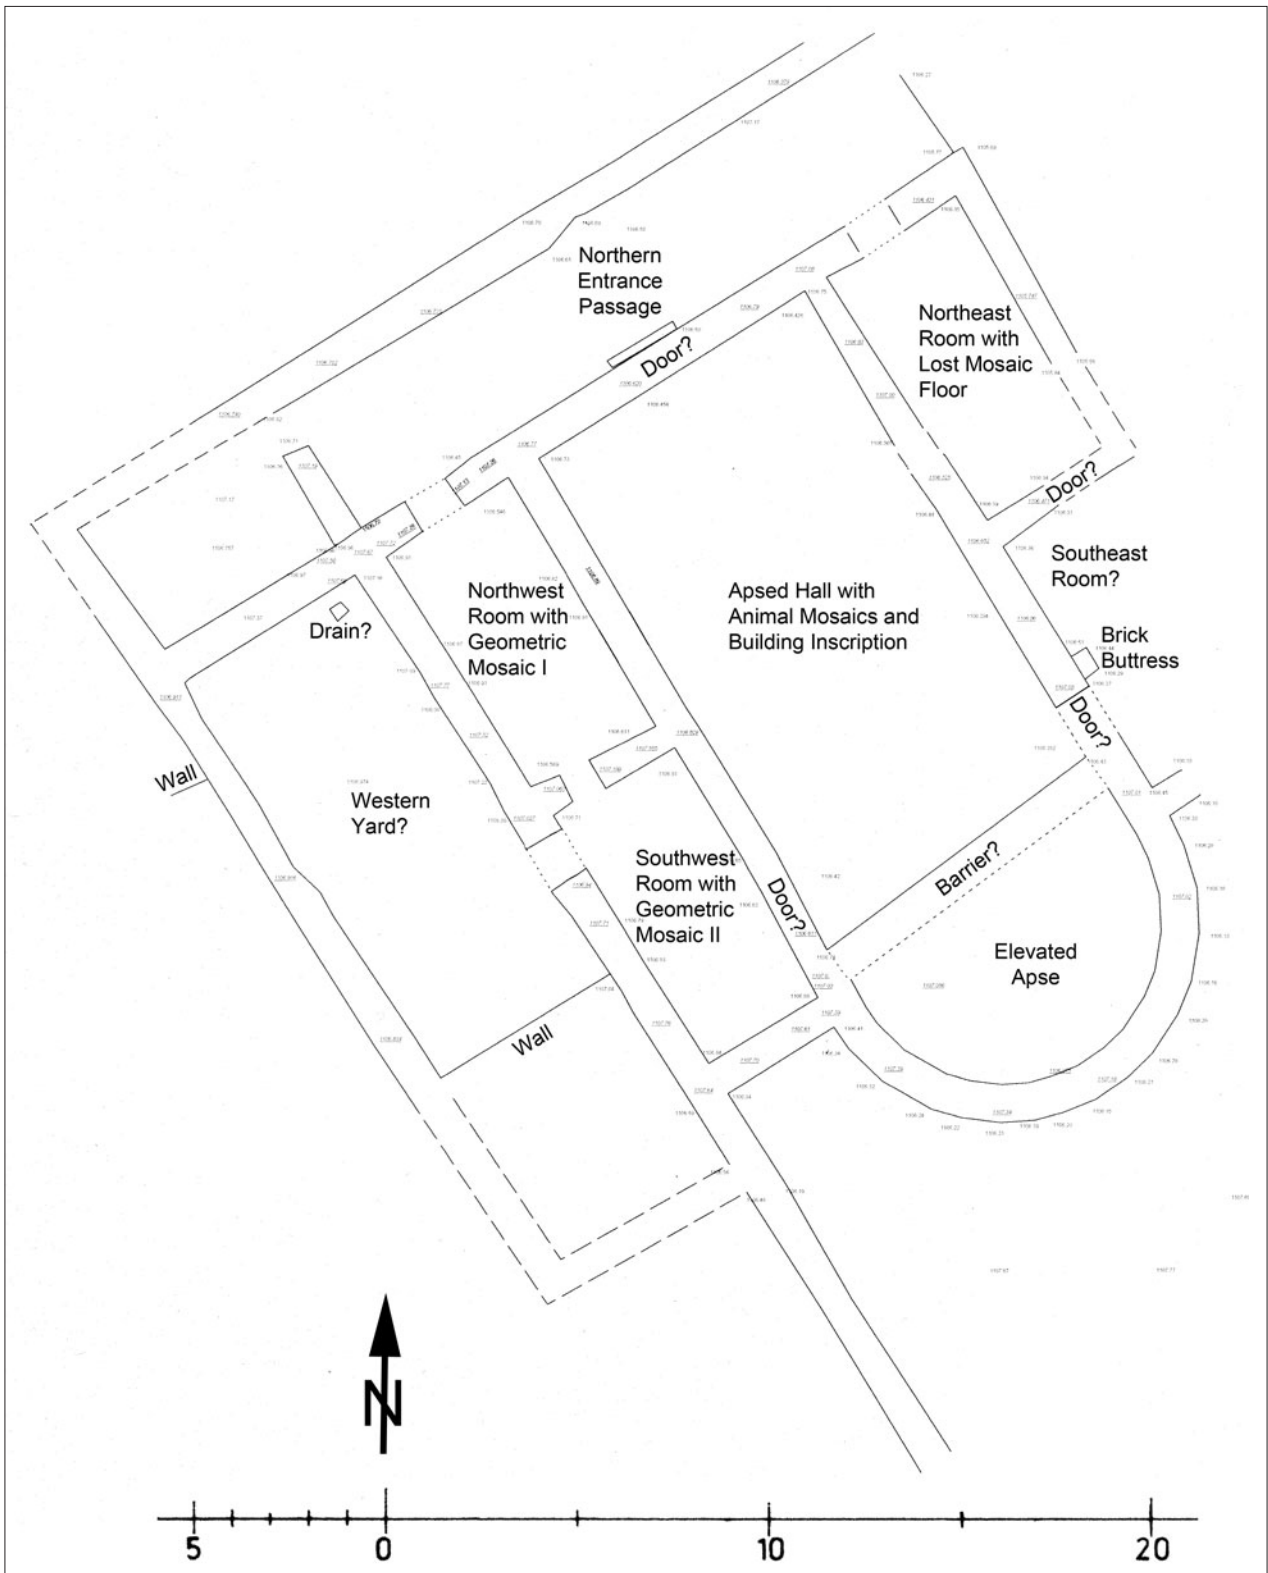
Plan of the early walls, doors and floors only (plan by M. Arslan and P. Niewöhner).
